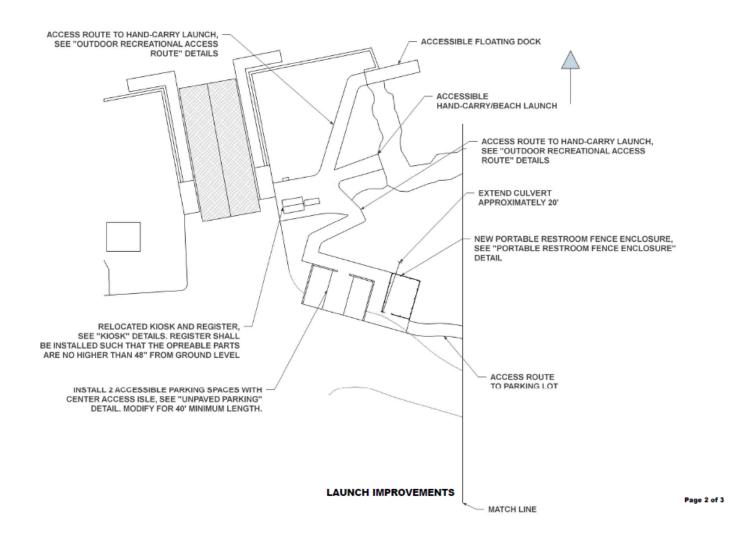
Site plan details for the construction of the accessible beach launch and vehicle parking at the Cranberry Lake BLS.
